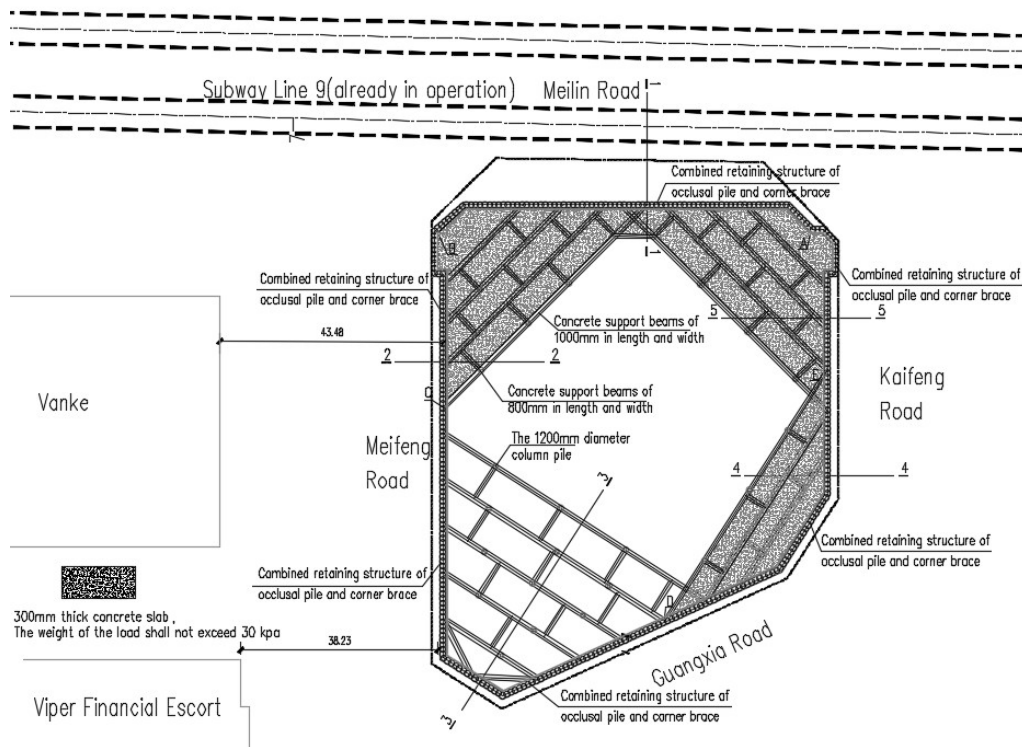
Layout plan showing the relationship between the new foundation pit and the subway tunnel
